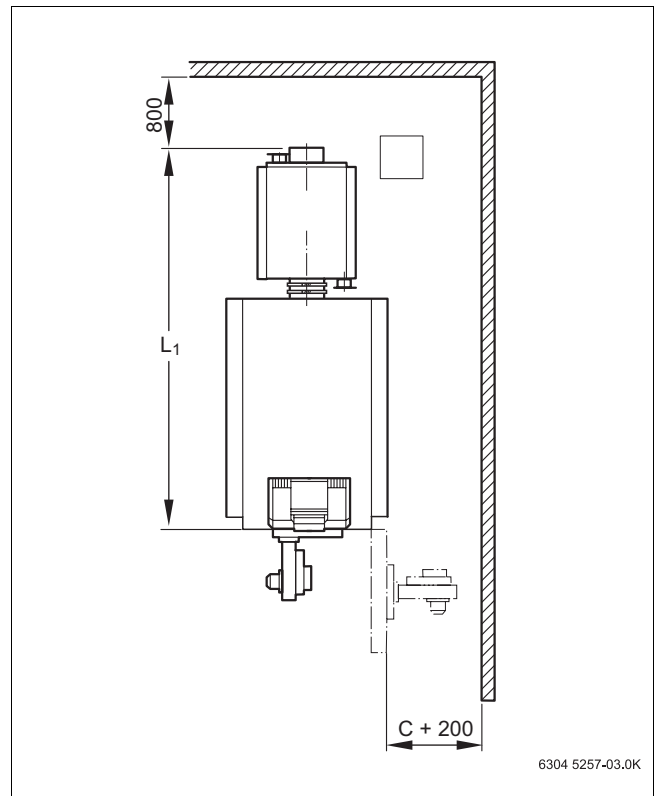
Boiler room with boiler and flue gas heat exchanger (dimensions in mm)
